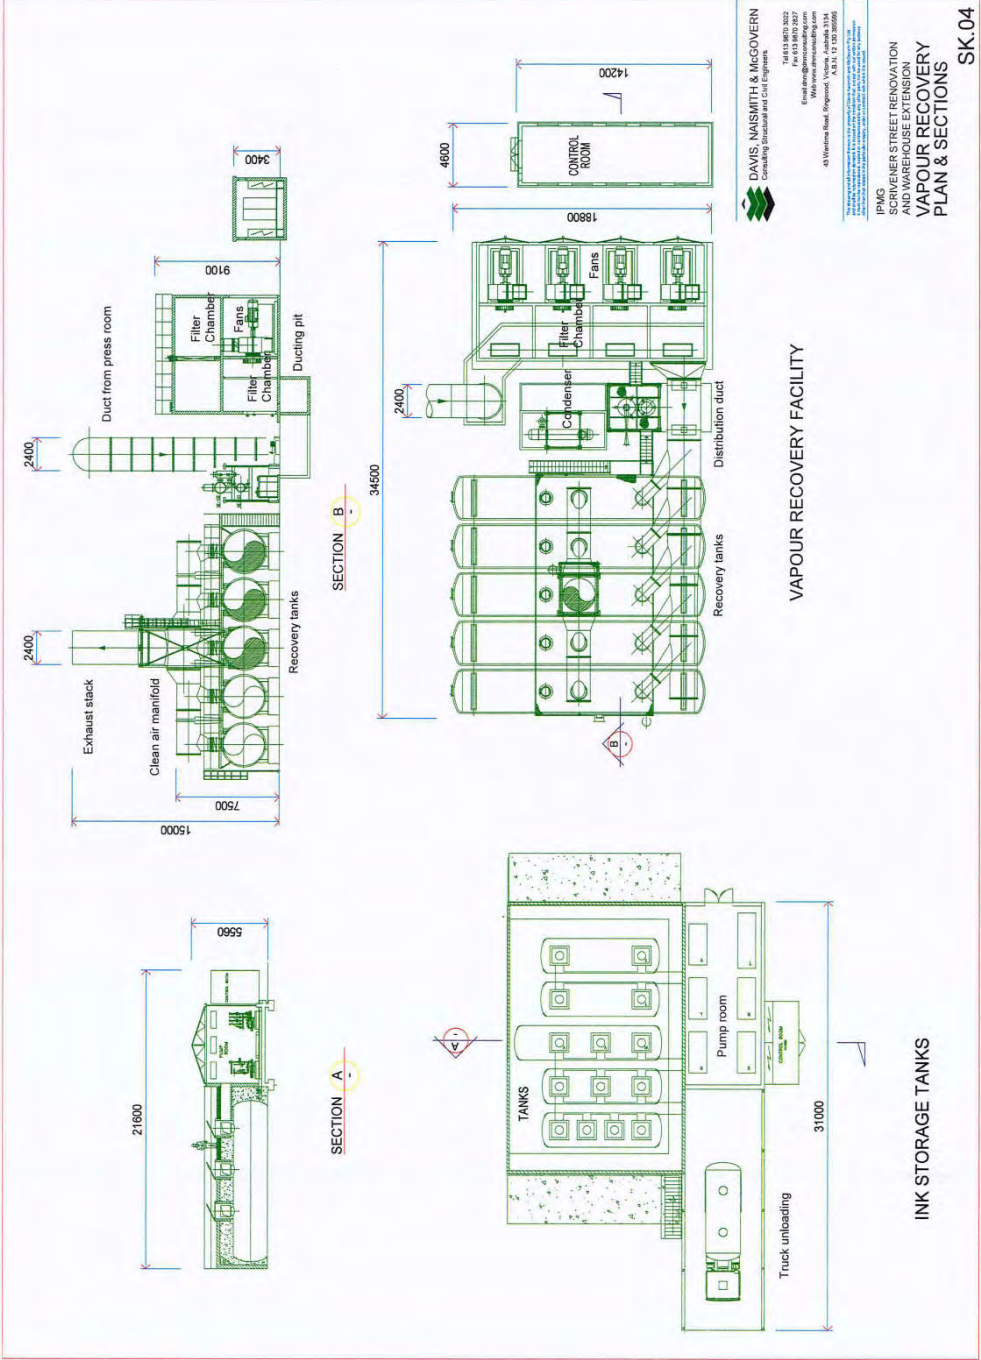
VAPOUR RECOVERY SYSTEM AND STORAGE TANK LAYOUT PLANS
